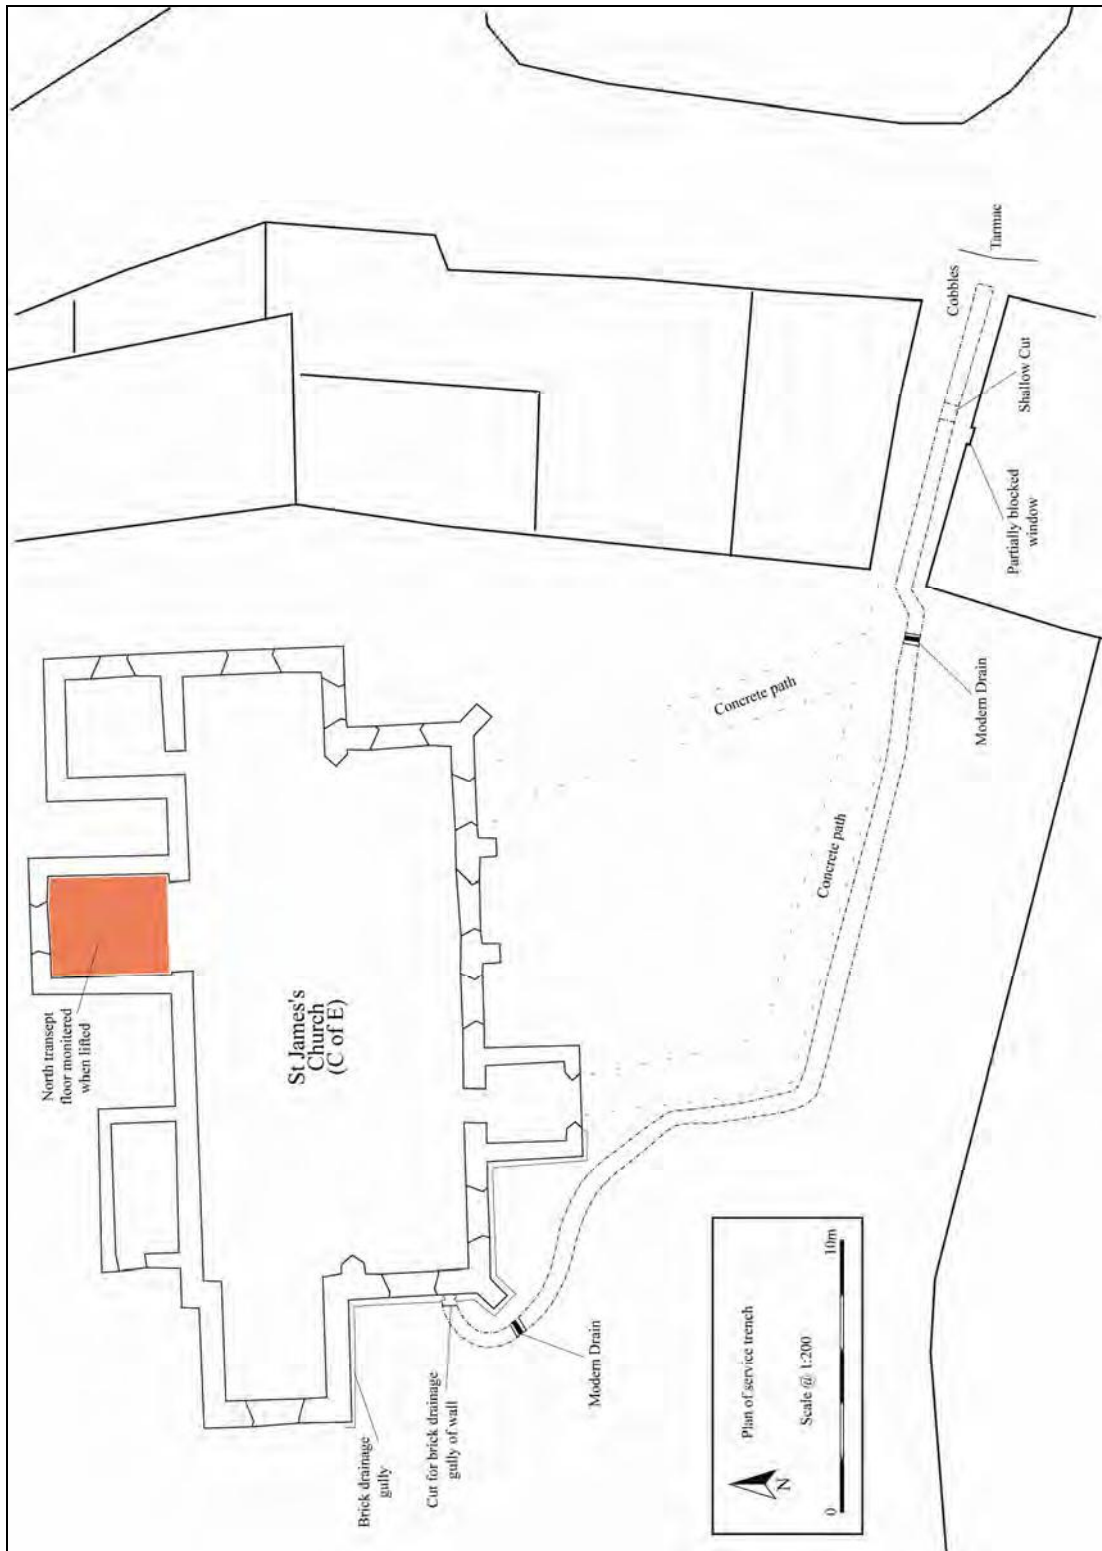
Location plan of monitored floor in red and excavated pipe trench.
